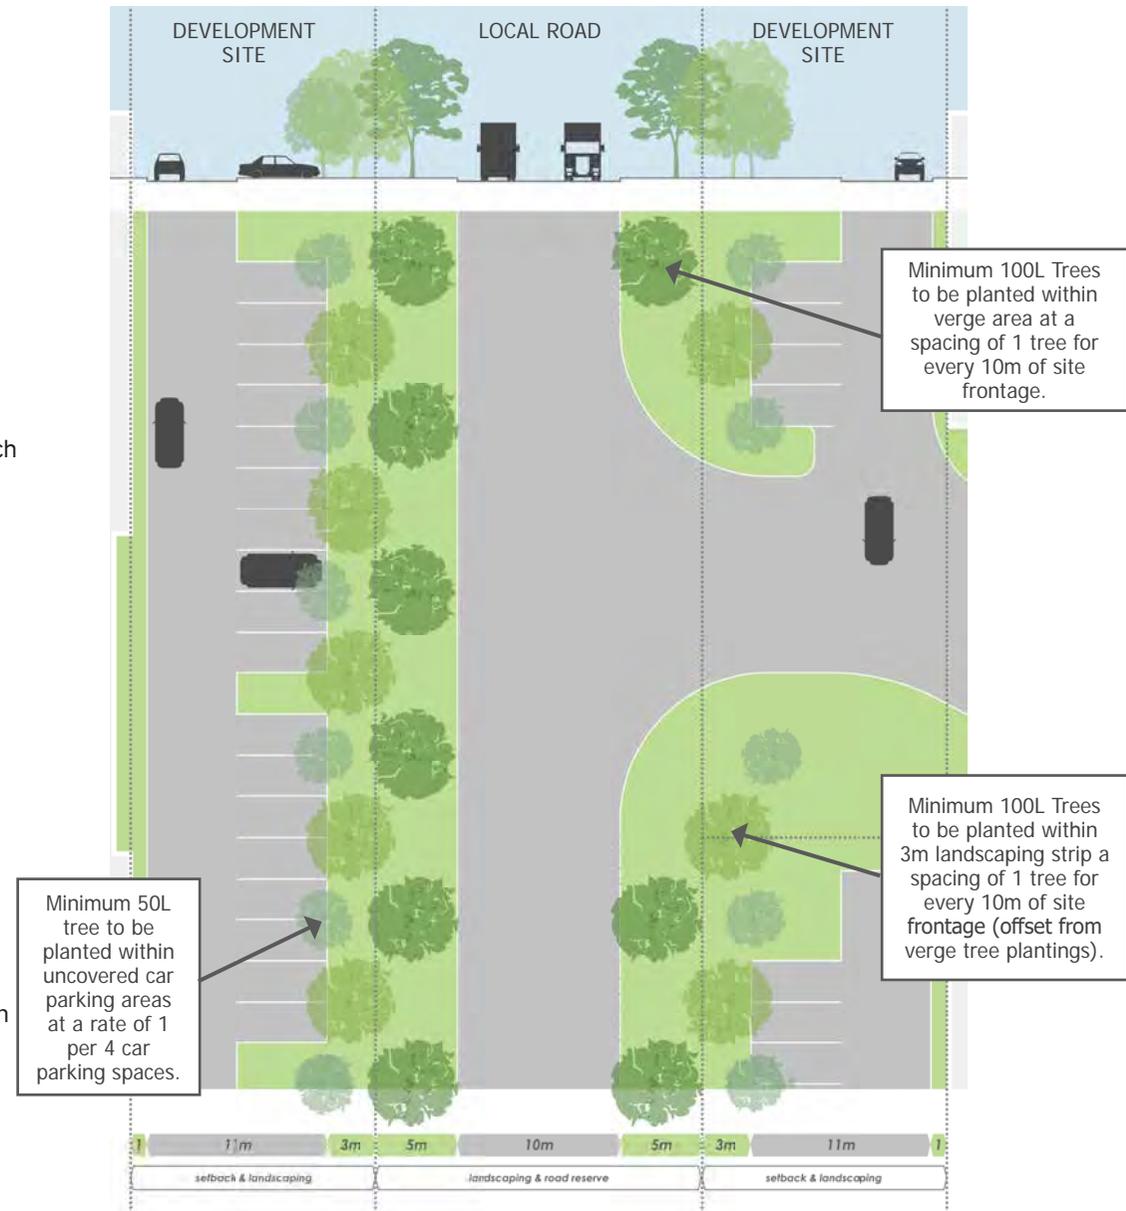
Cross section outlining the primary street frontage landscaping requirements within front setback area and road verge in accordance with the development controls under section 2.5.1 and 2.5.2.
